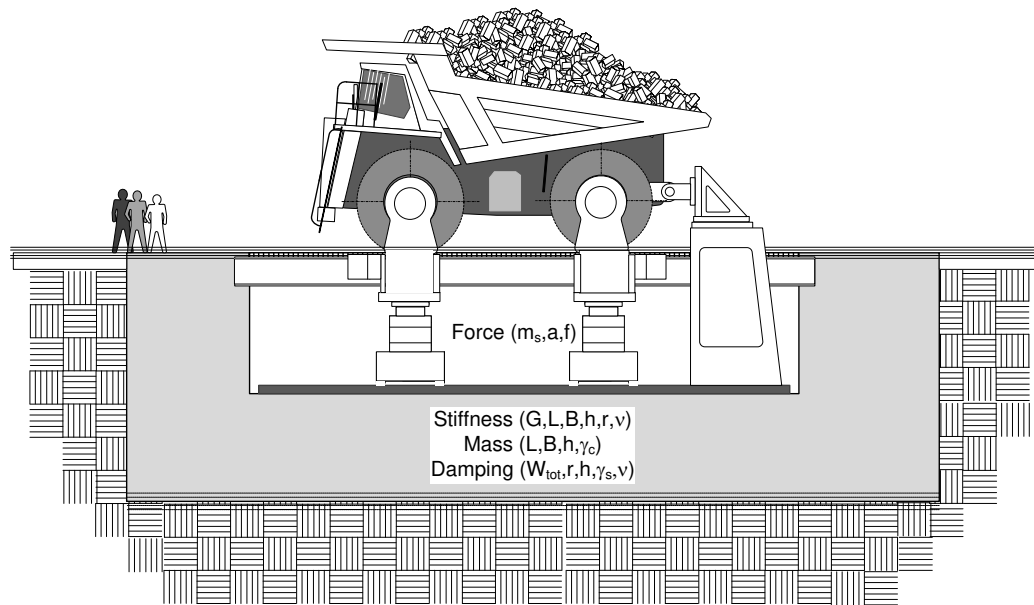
Large rigid concrete equipment foundation supporting a hydraulic test rig for heavy equipment
